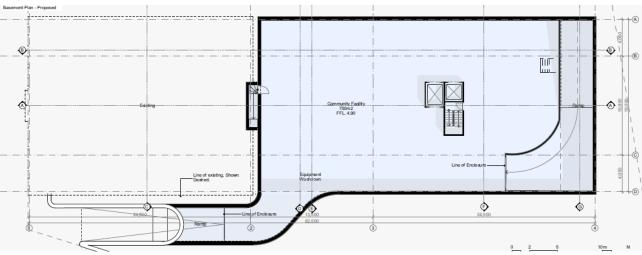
Proposed basement plan. Source: Lockhart-Krause Architects, 2021
